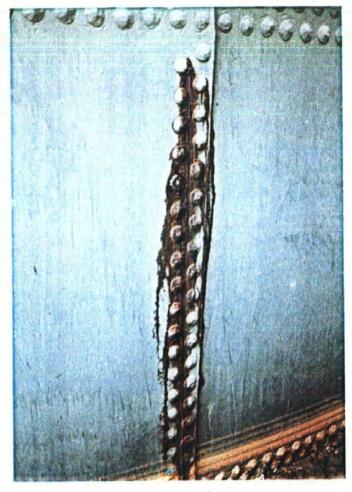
Oil Seepage from Plates & Rivets, Tank A-7. 4/5/85
